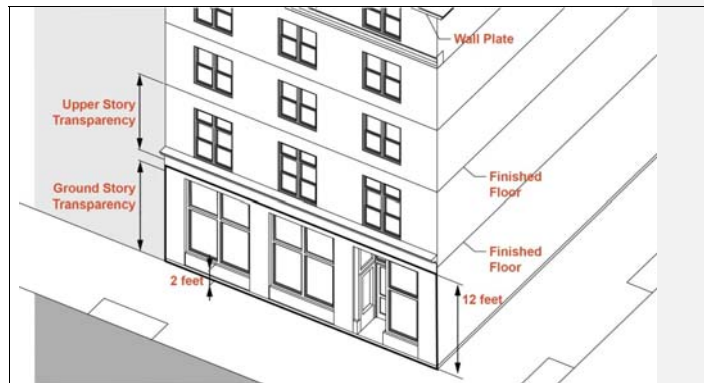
B253.10 - Ground Floor and Upper Floor Façade Glazing
